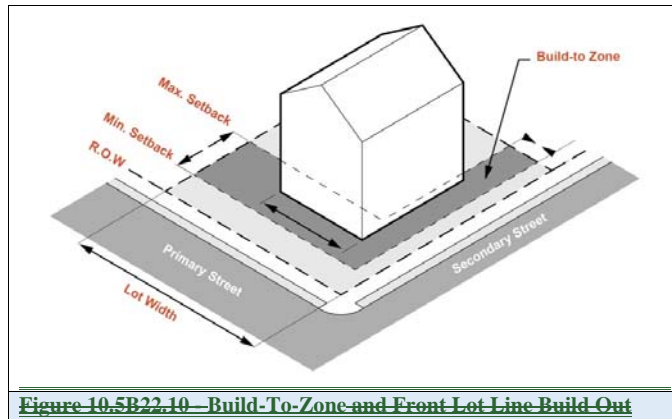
B22.10 – Build-To-Zone and Front Lot Line Build Out
